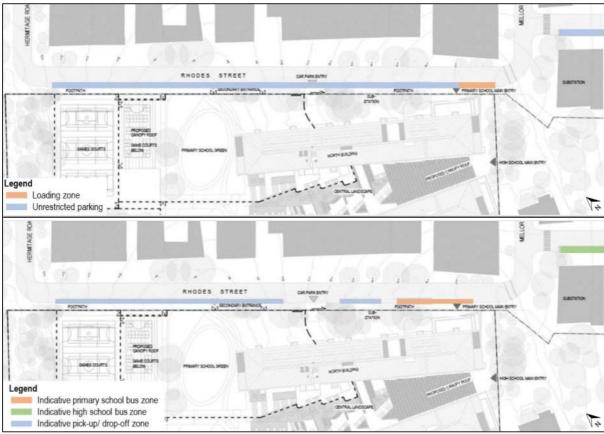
| Existing (top) and proposed (bottom) on-street parking arrangement (Base source: Applicant's RtS
